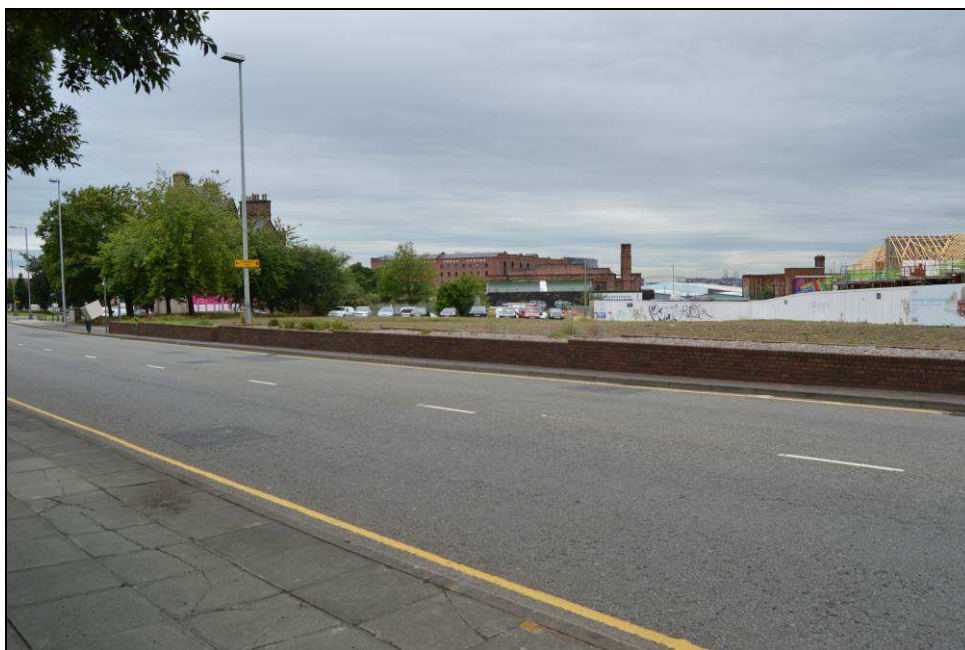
View looking south from Great George Street showing the south end of the proposed development site
